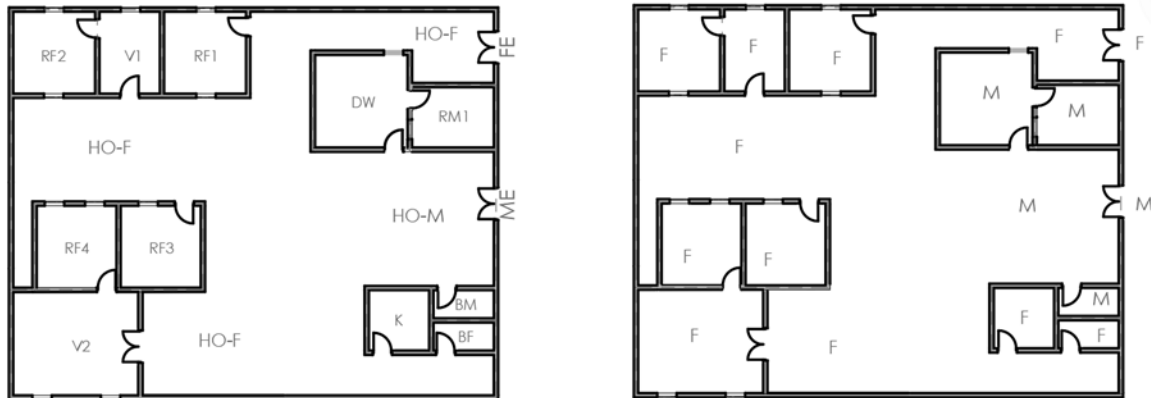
Case 6 - Layout Plan and the Male & Female Domains Layout
